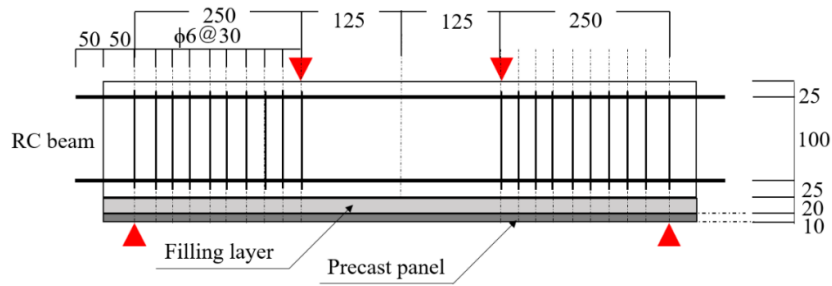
Arrangement of longitudinal reinforcement and stirrups on the beams reinforced with precast panels.
